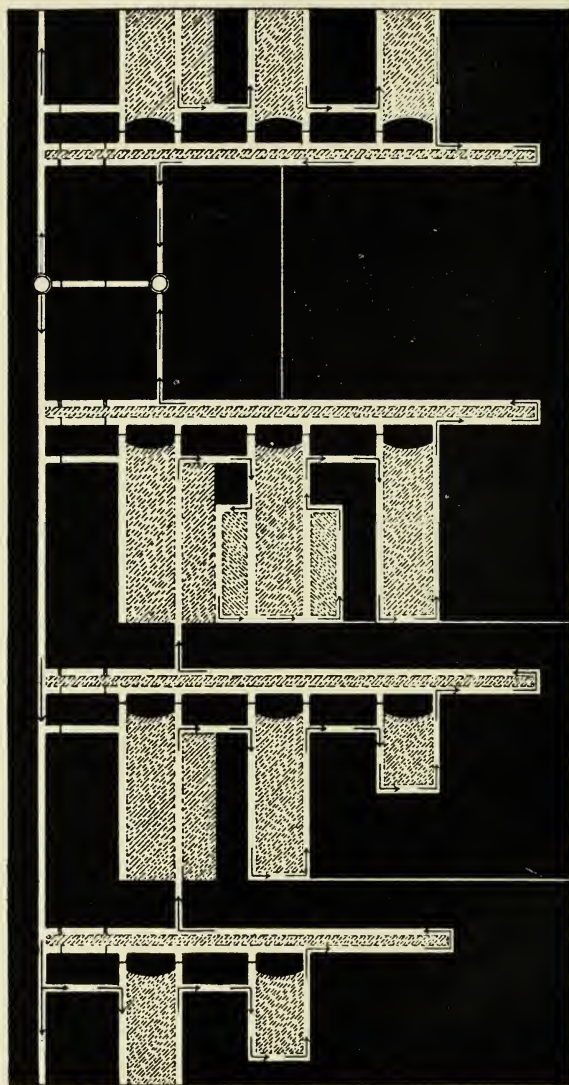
ARRANGEMENT OF THE SINGLE ROAD STALL SYSTEM OF WORKING COAL IN SOUTH WALES, WHERE THE ROOF IS VERY GOOD.
